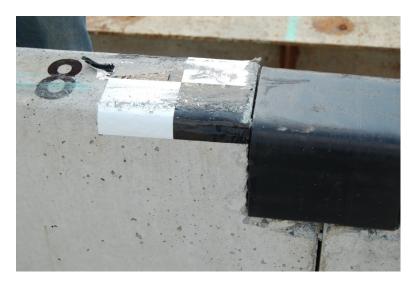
Barrier No. 8 Damage, Test No. NYTCB-5
